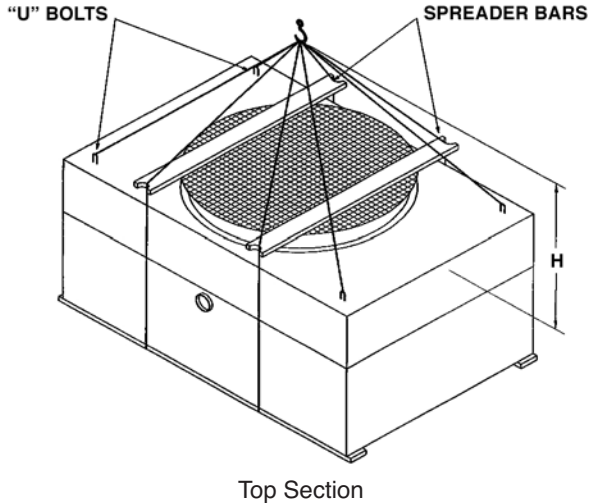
Proper Rigging Method for Extended Lifts (top section)
